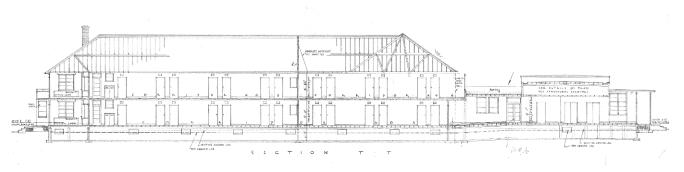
1955 Construction – Typical Longitudinal Building Section
